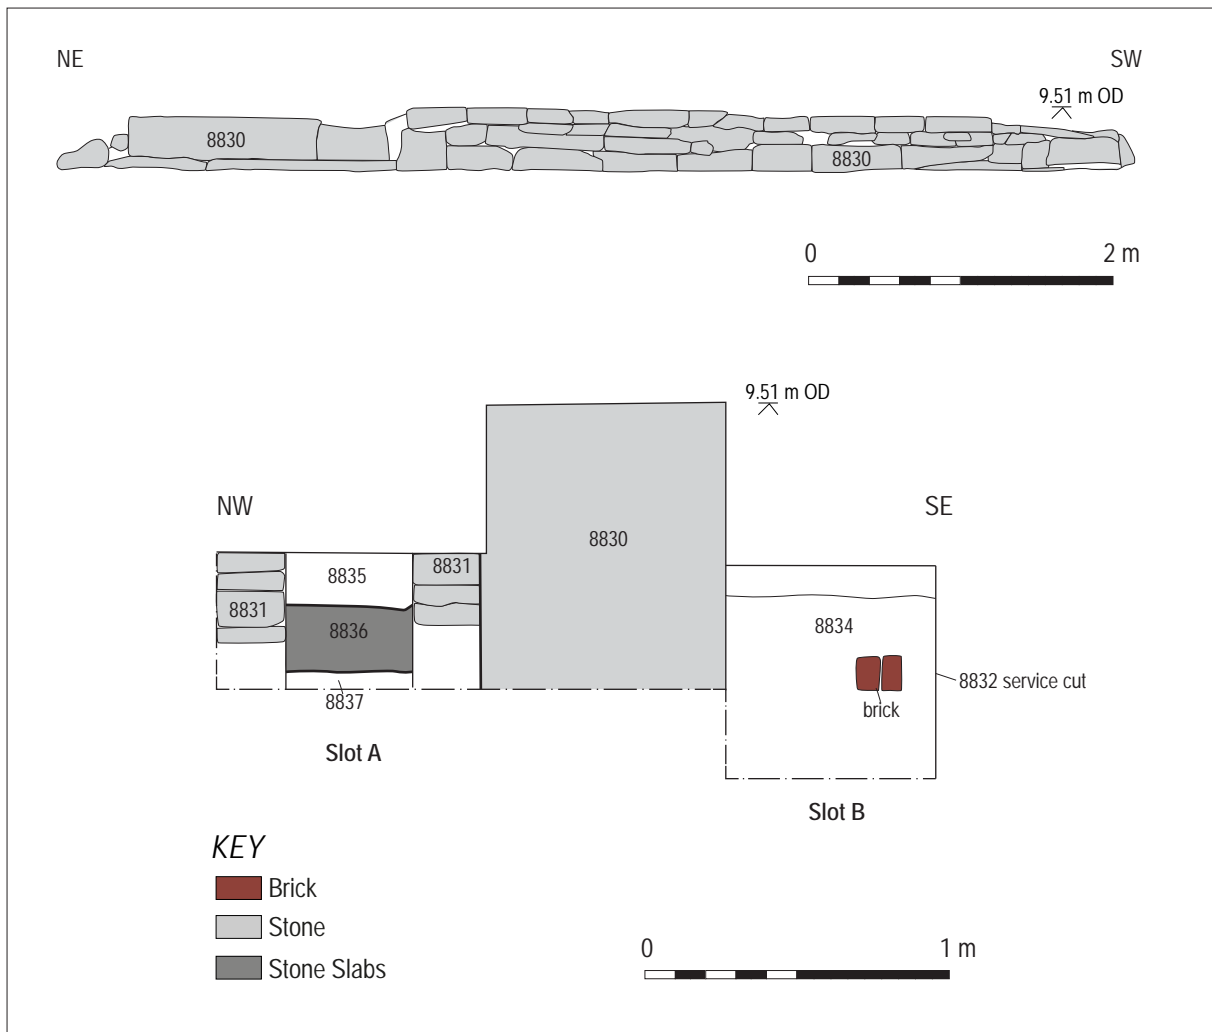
Section and elevation of tenement foundations at the Foot of the Walk
